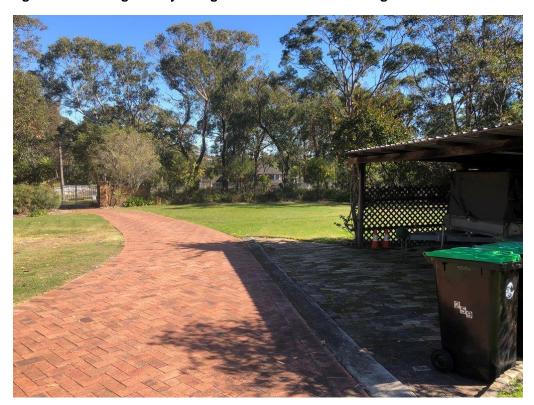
the existing driveway leading from Aumuna Rd to the dwelling house. The existing carport is to be demolished.
